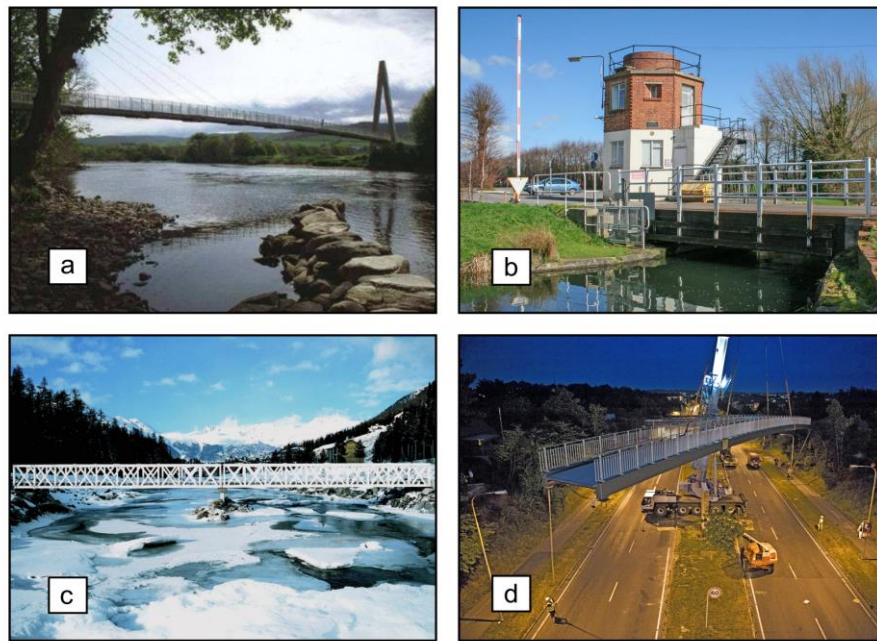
(a) Aberfeldy Bridge, (b) Bond-Mills Bridge, (c) Pontresina Bridge, (d) Svendborg Bridge [2.7, 2.19].
